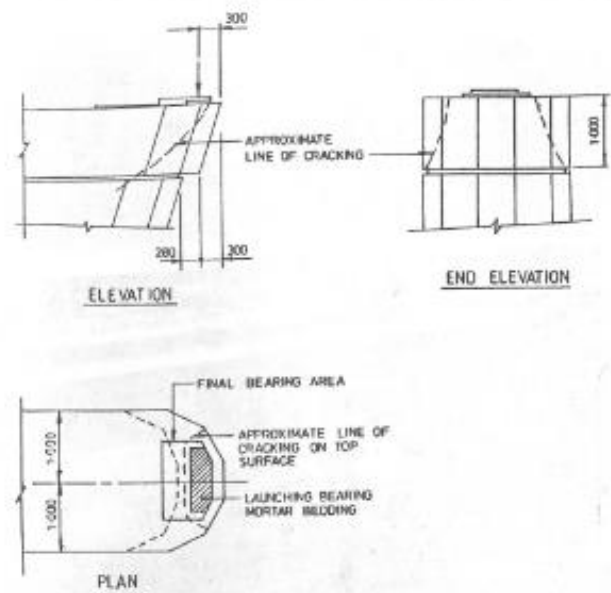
LOCATION OF CRACKING IN PIER CAP OF NORTHBOUND BRIDGE
